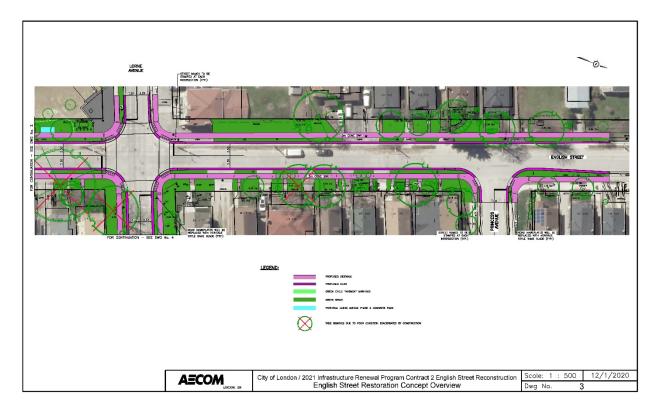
English Street Infrastructure Renewal Project design drawings for English Street between approximately Dufferin Avenue and Lorne Avenue. Note: interface of English Street at Lorne Avenue Park.
